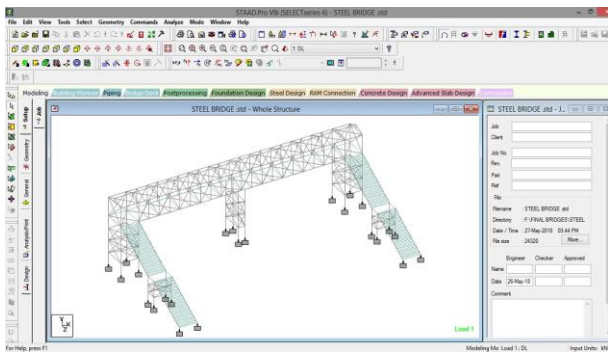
Modeling of Cold Formed Steel Bridge in Staad-Pro
